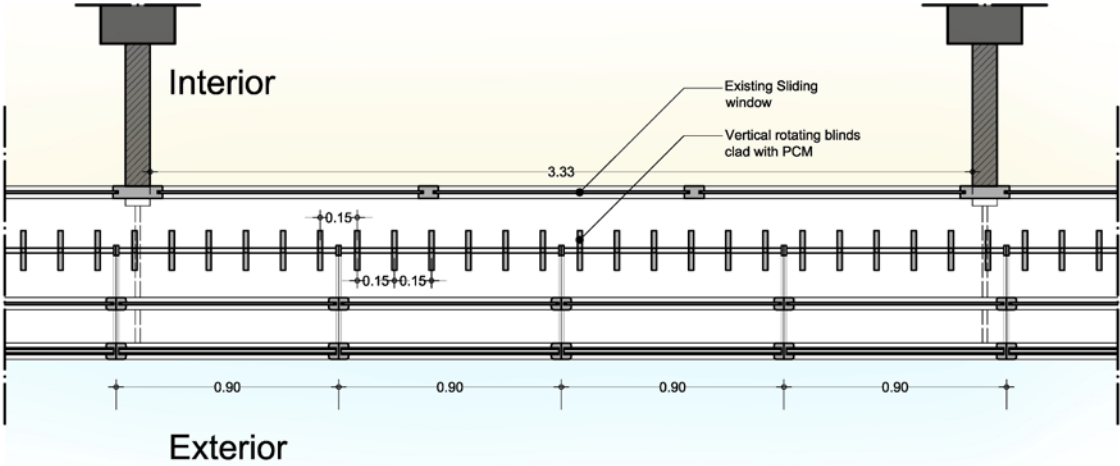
Floor plan of the proposed retrofit module installed on a curtain wall facade.
